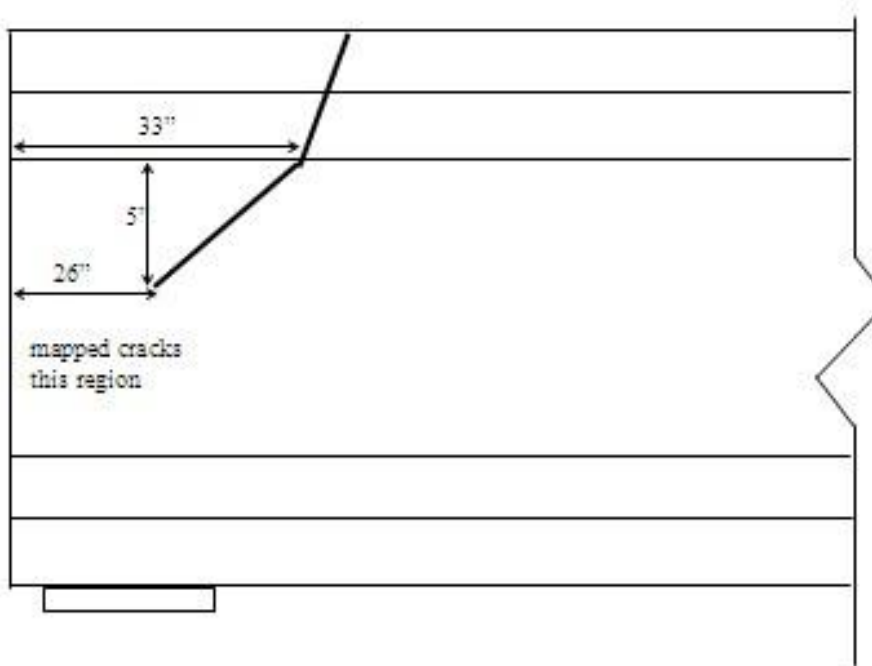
Crack diagram for south span girder, 2nd beam from east side, east face, south abutment (#7933).
